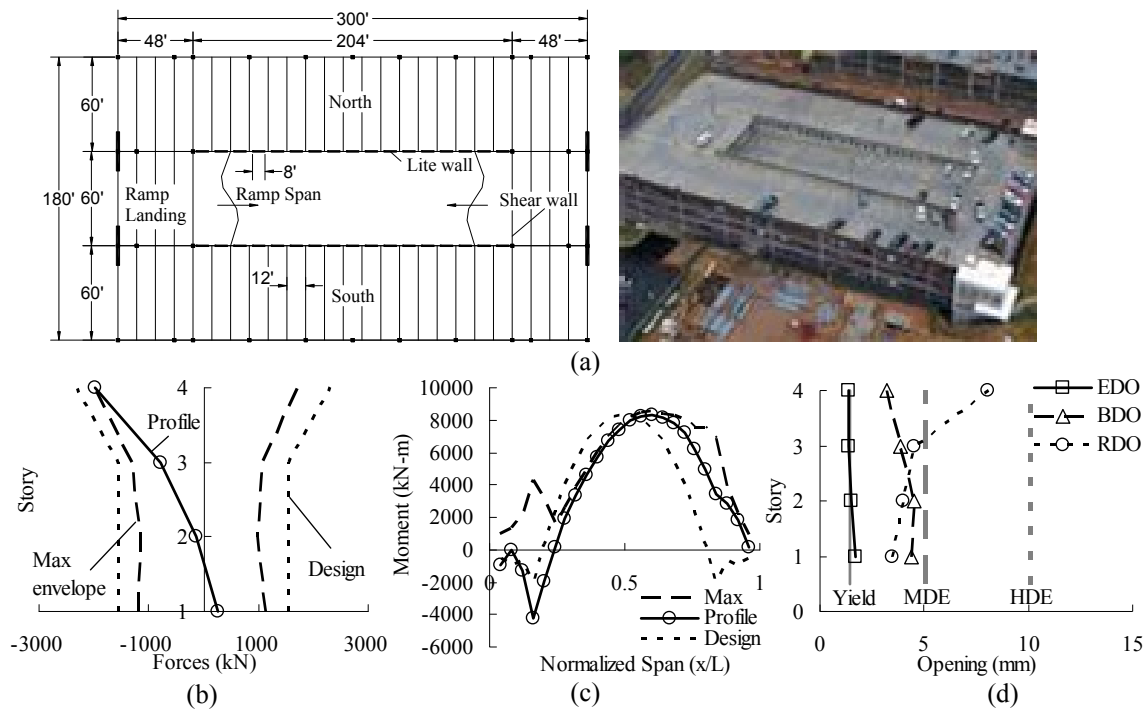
Prototype parking structure: (a) Floor plan and isotropic view (b) Diaphragm inertia; (b) North sub-diaphragm moment; (c) Diaphragm joint opening.
